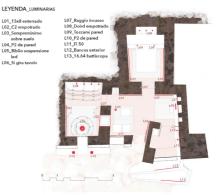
Plan of the cave with lighting distribution. Credits: Salvador Silvestre.
